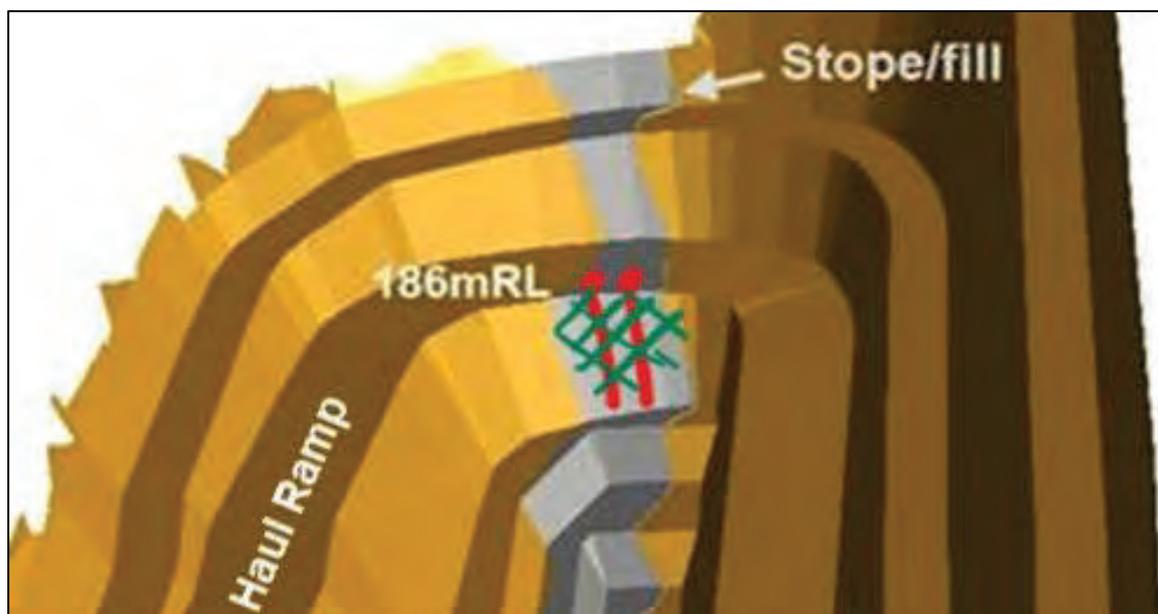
View looking south showing support for stope fill crossed by haul ramp at southern end of pit
